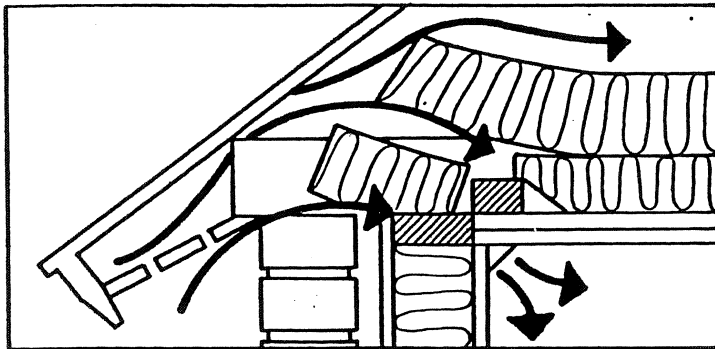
b The insulation material at the eaves has not been properly fitted. Air enters between the mineral wool slabs, reducing the insulation capacity. The wall section and a portion of the ceiling become cold due to air leakage.
